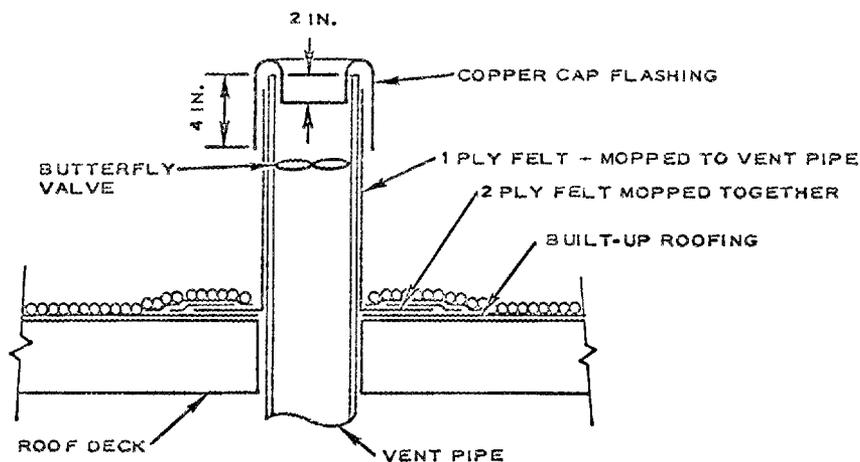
Vent Pipe Penetration Through Builtup Roofing. (From ref. 2)
